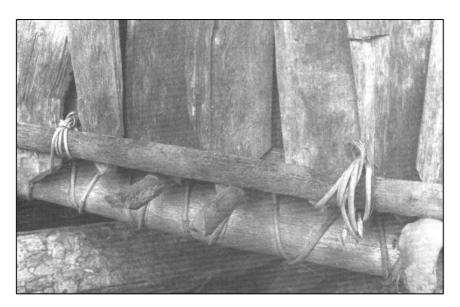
Darai house (Indonesia). The base plane and vertical plane elements are connected using ropes made of natural fibres (Pétrequin 1988).
